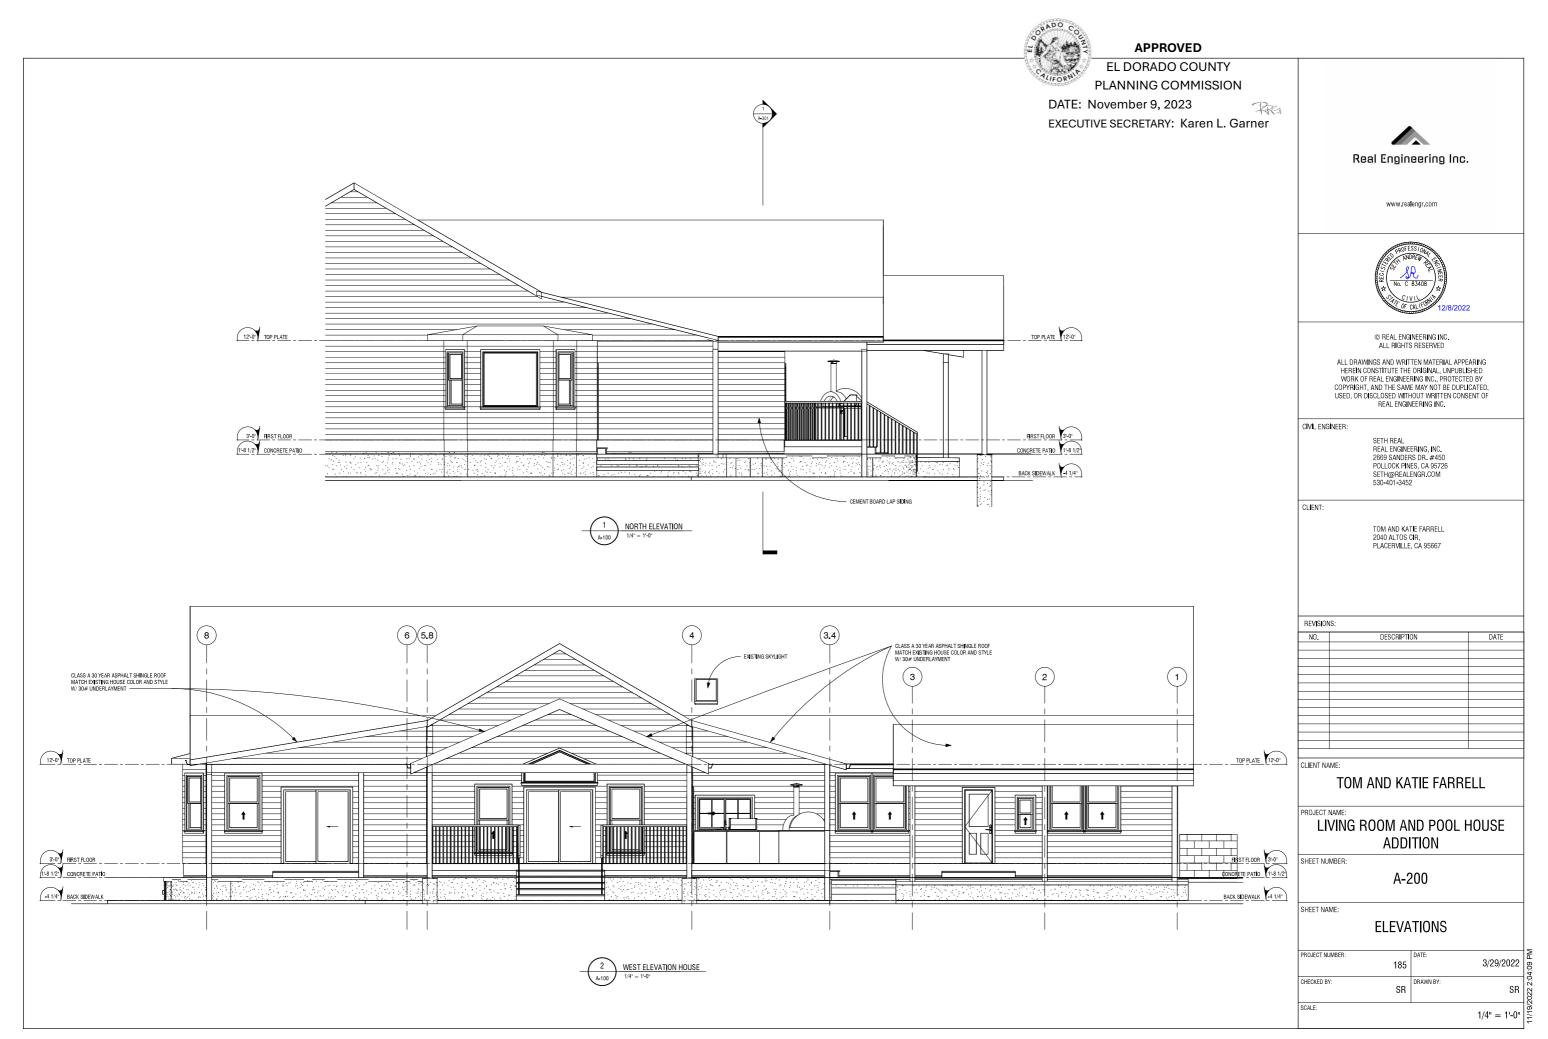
Exhibit E: Project Plan Sheets CUP22-0015/Farrell Nonconforming Use (New Build)
